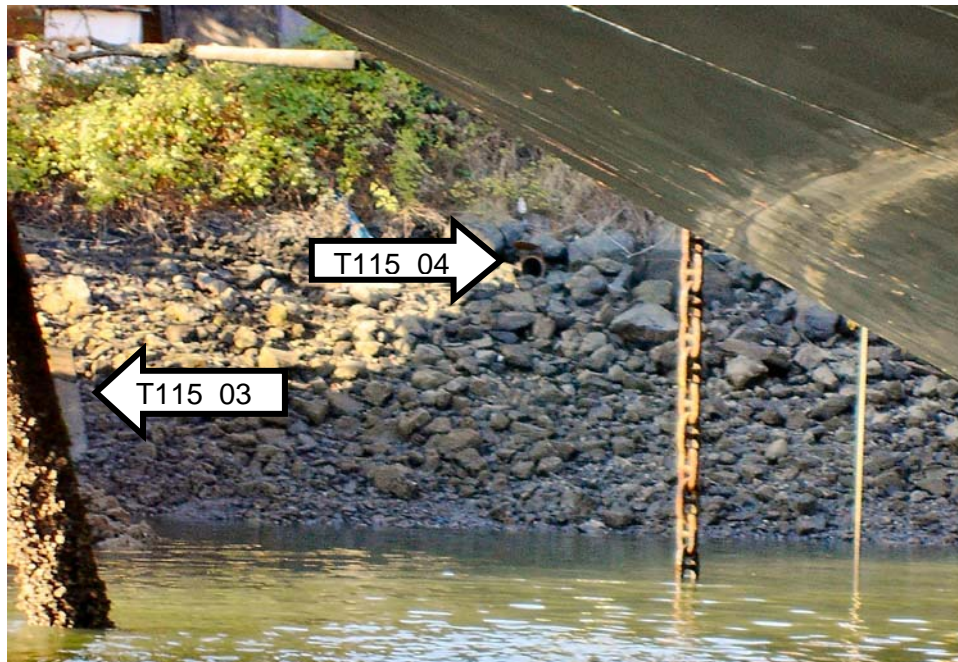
Looking west at outfall T115_04 (right) a 12” composite pipe and the edge of outfall T115_03 (left). The ship in the upper right corner is also shown in Photo 100-0938.
